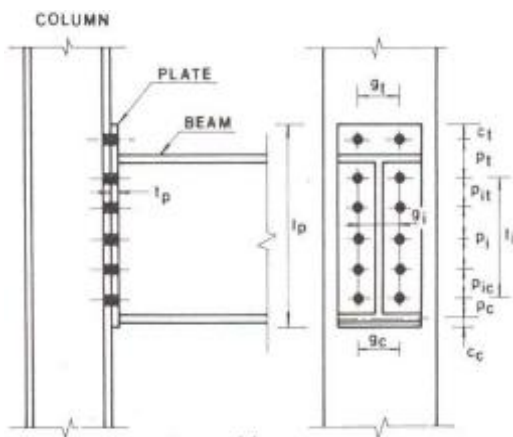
Extended End-Plate Connections (Tension Side Only)
